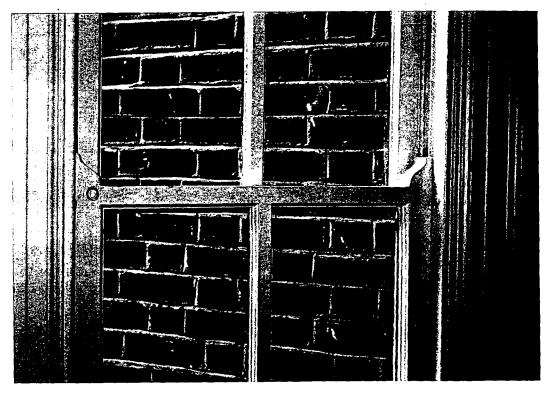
Interior detail view of meeting rail with tailpieces. Window No. 205.
